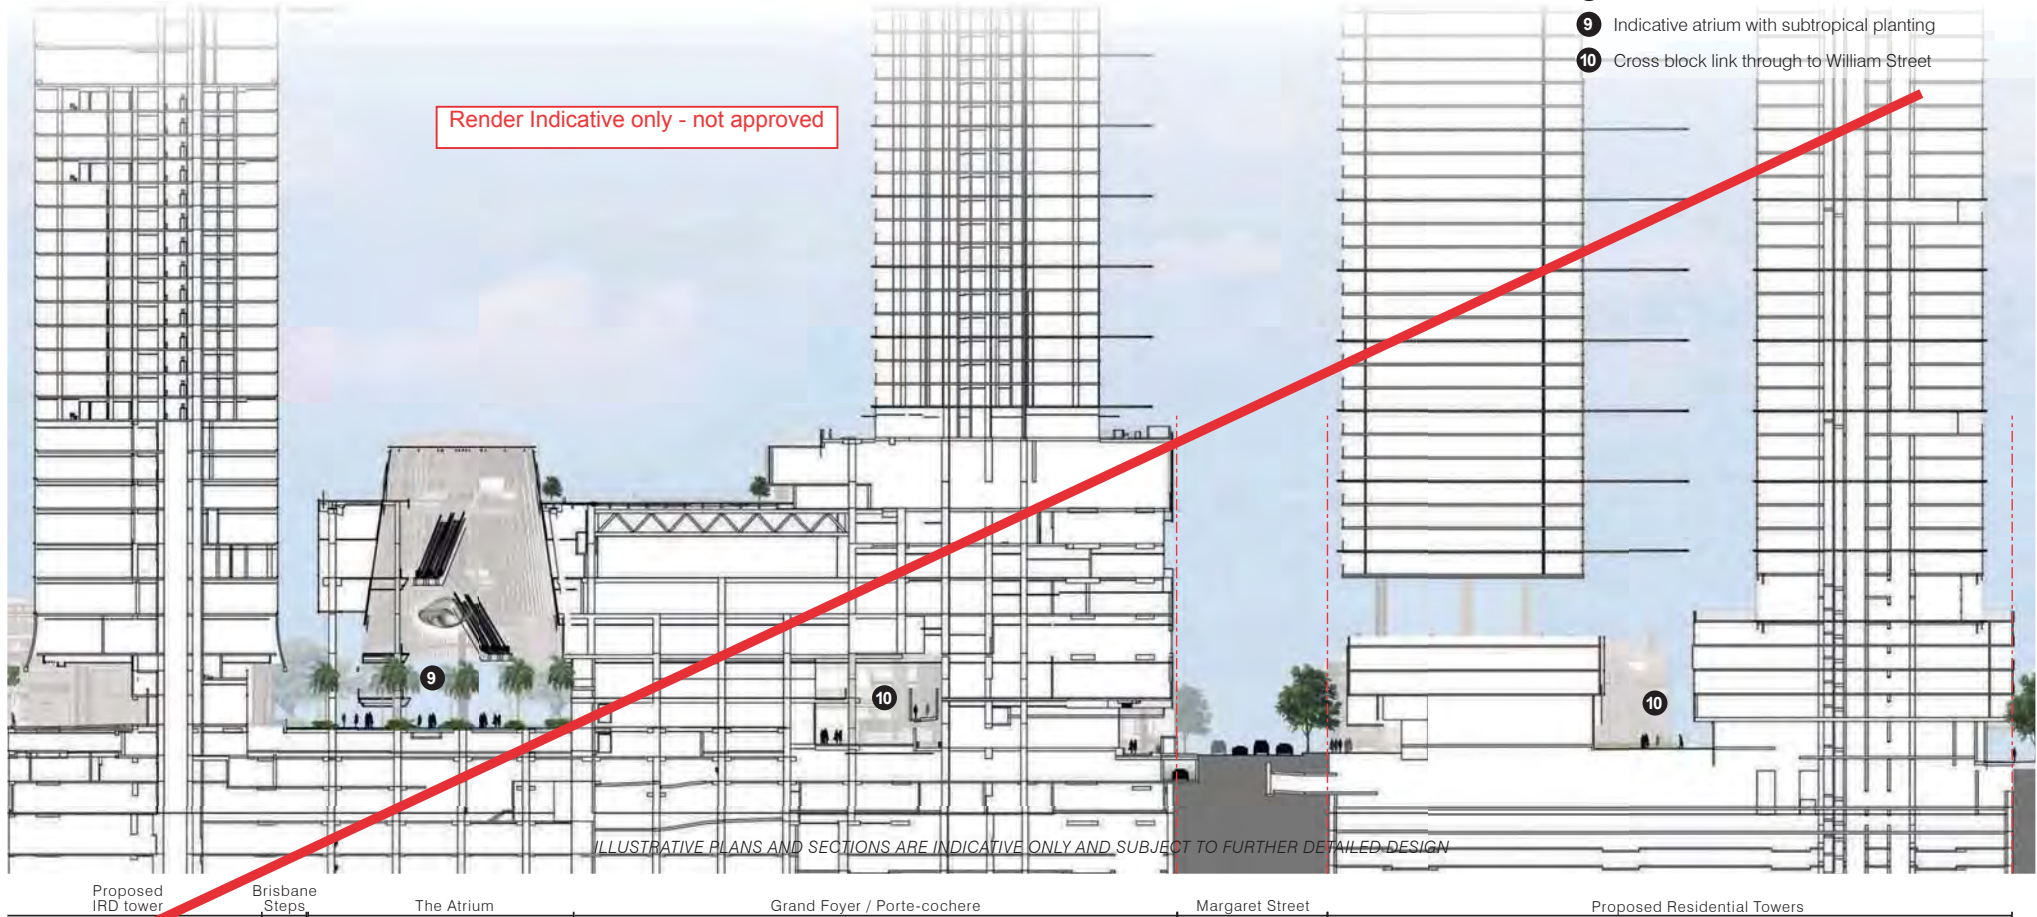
Ridgeline Sectional Elevation from the former Treasury Building to Alice Street (Not to scale)
